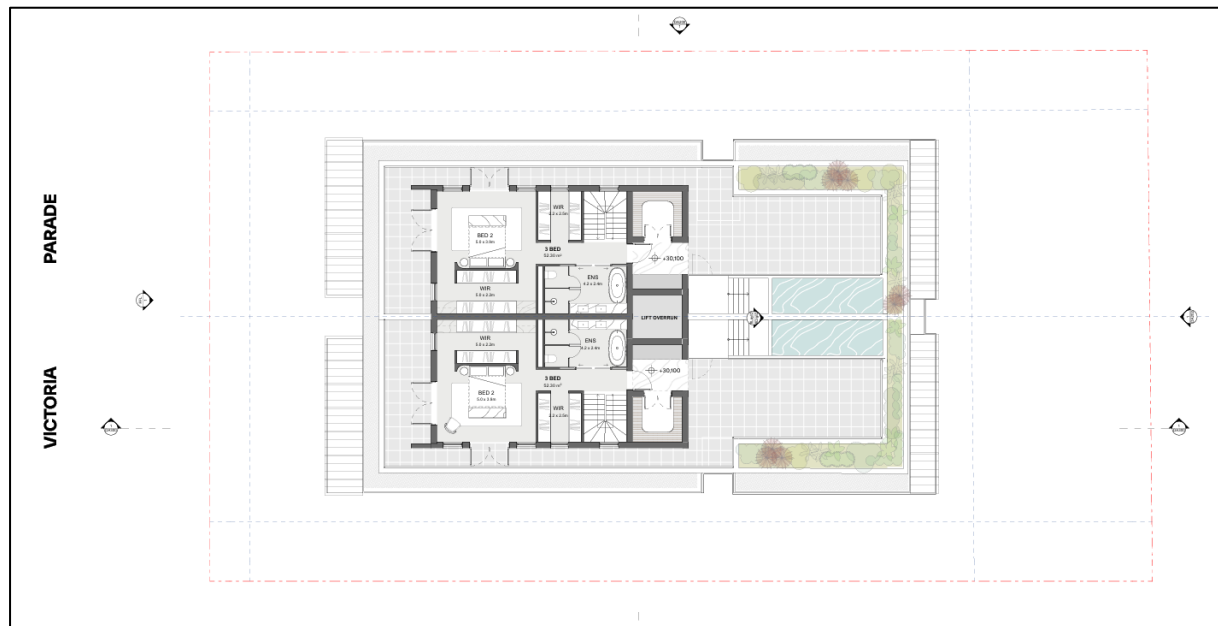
Floor Plan for Level 8 (Source: PBD Architects, 2026)
